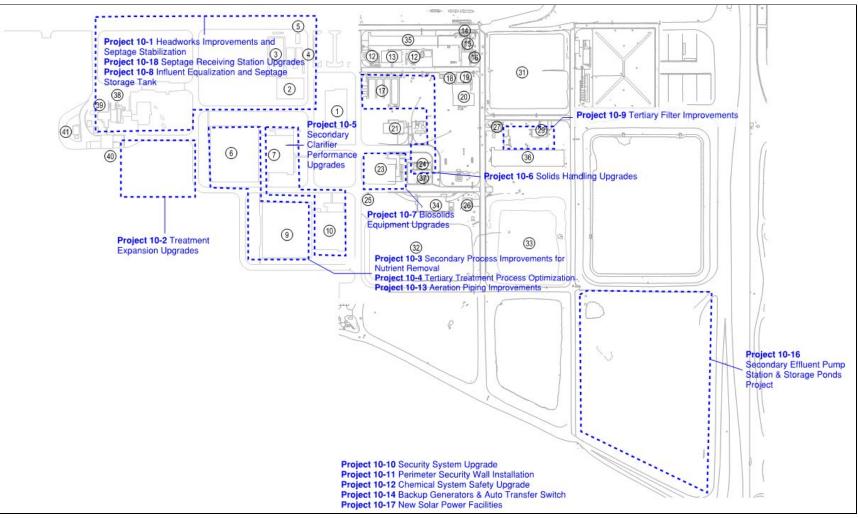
WRP 10 Existing Site Plan and Proposed Improvements
